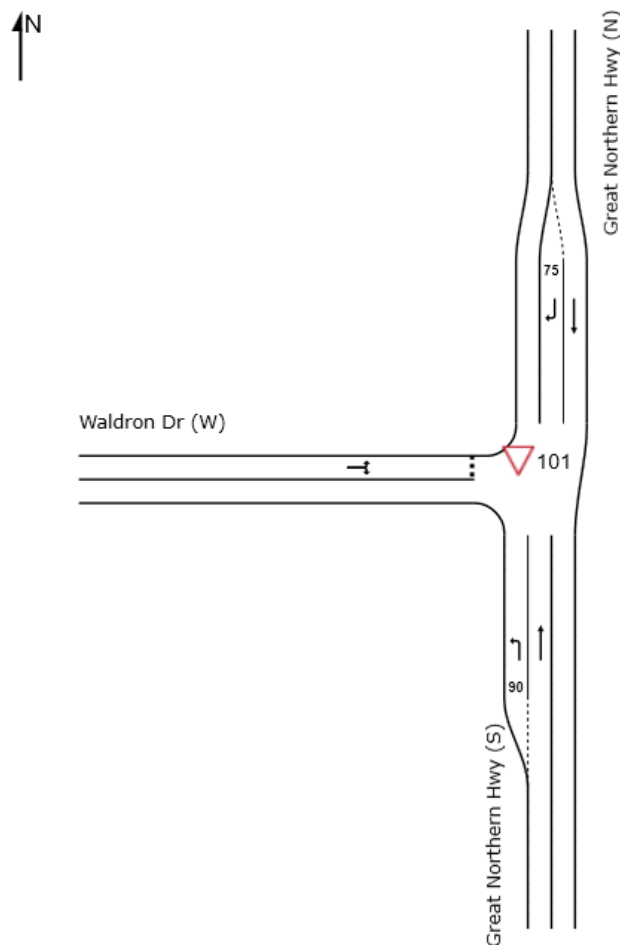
Existing Great Northern Highway / Waldron Drive SIDRA layout
